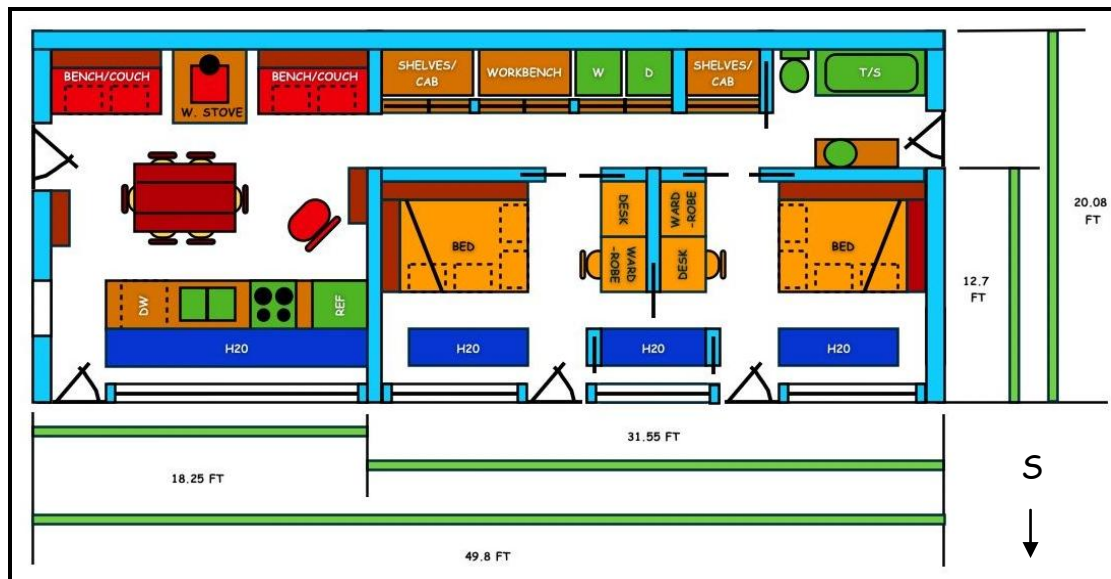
ENGR 1010 “Engineering in the 21<sup>st</sup> Century” Example Solar Home Floor Plan
